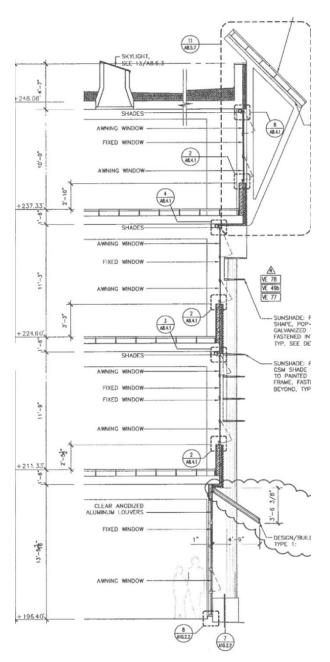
Section through south facade Image credit: Daniel Solomon Design Partners
